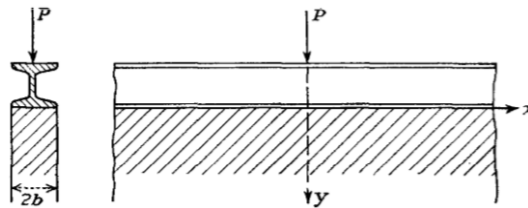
10 Beam resting on infinite wall, in Biot's approach
